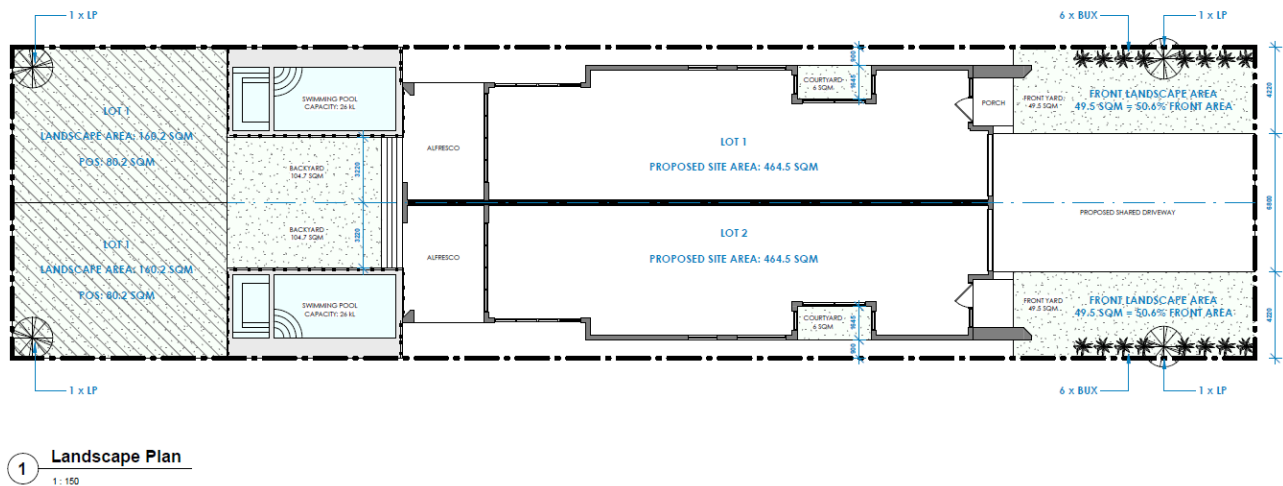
668 Henry Lawson Drive, East Hills NSW 2213 – Landscape Plan
